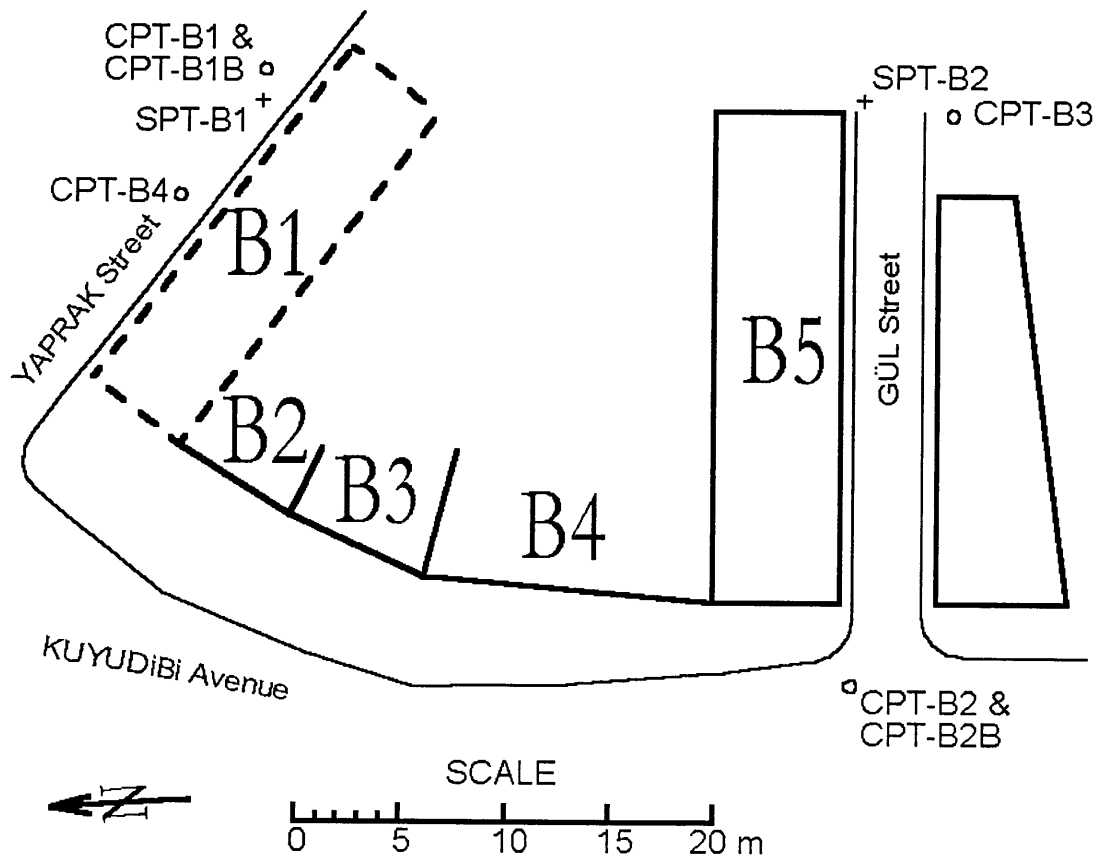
Plan view of Site B and location of subsurface exploration points
